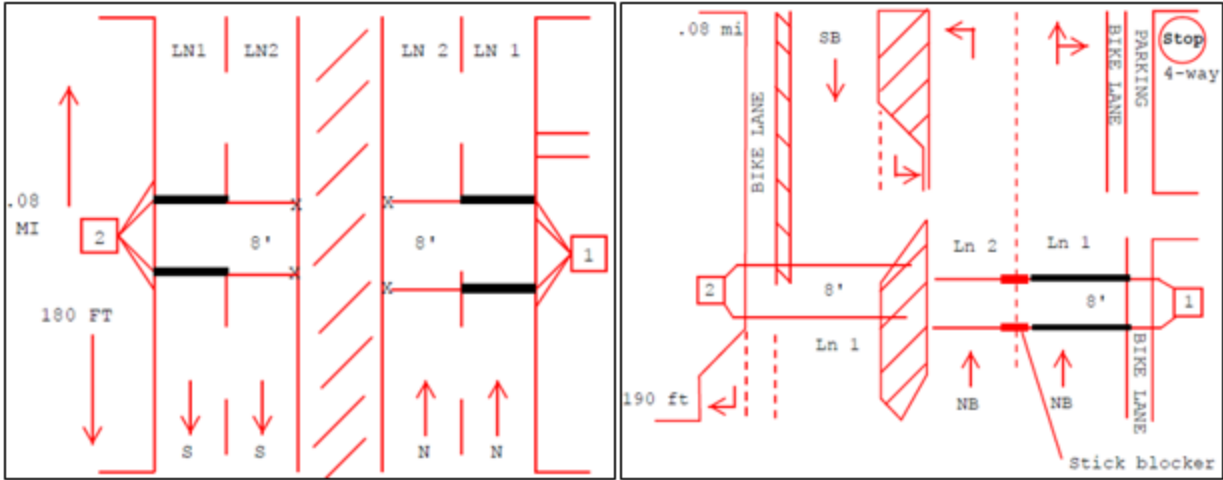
Schematics of Ridge Top Road Site 2 Data Collection Locations Before (Left) and After (Right) Road Diet. Images provided by The Traffic Group, Inc. Reprinted with permission.
